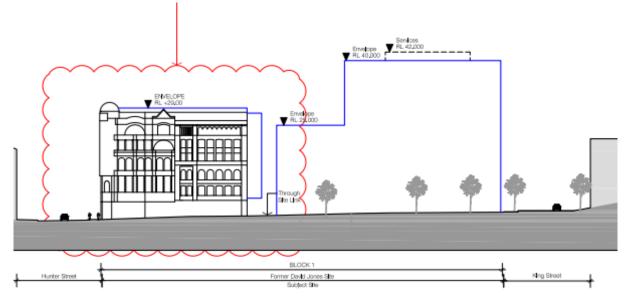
Perkins Street elevation showing modified building envelope for Former David Jones building Block 1 (Stage 1) (Source: SJB Architects)
